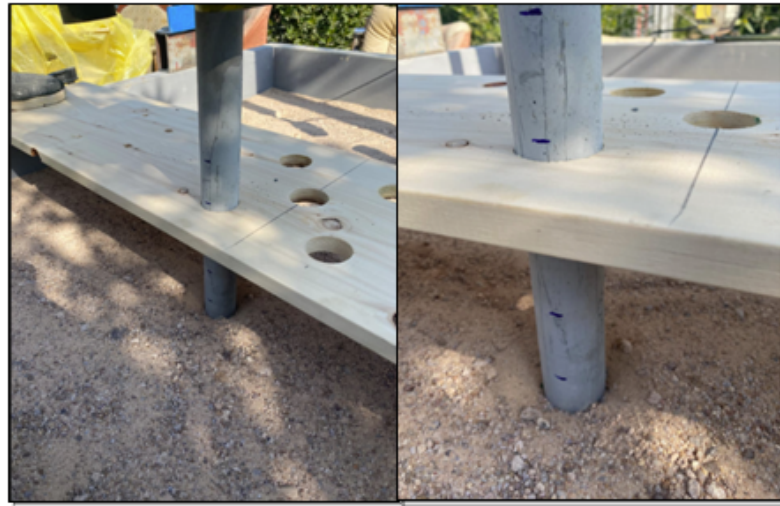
Pile group system installation showing the guided alignment frame, wooden positioning panels, and steel support columns used to ensure uniform spacing and verticality during driving of 2-pile and 4-pile group configurations.
